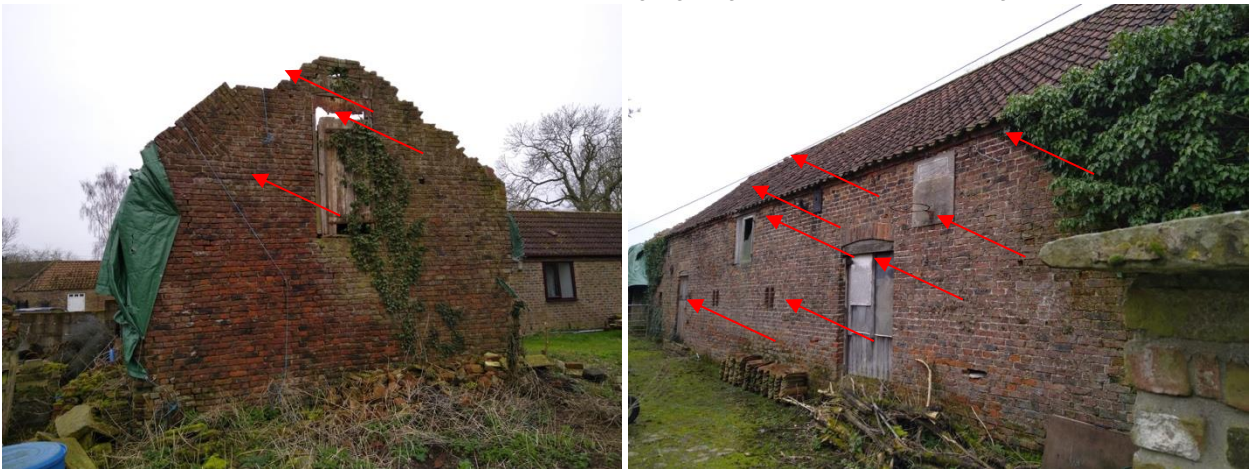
(L) – Northern elevation, (R) – West elevation; highlighting potential access/roosting points
